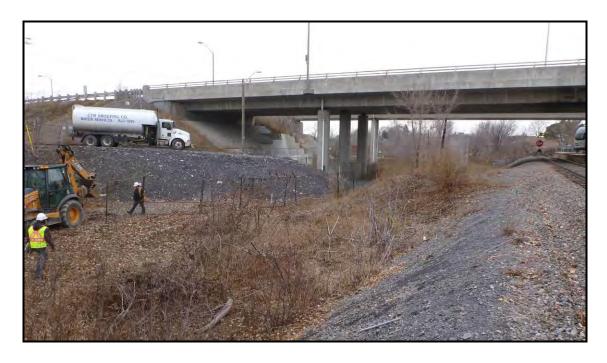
Extensive recent fill within the active rail corridor abutting the proposed location of Test Trench 1, facing northwest. (PR15-41D161)
